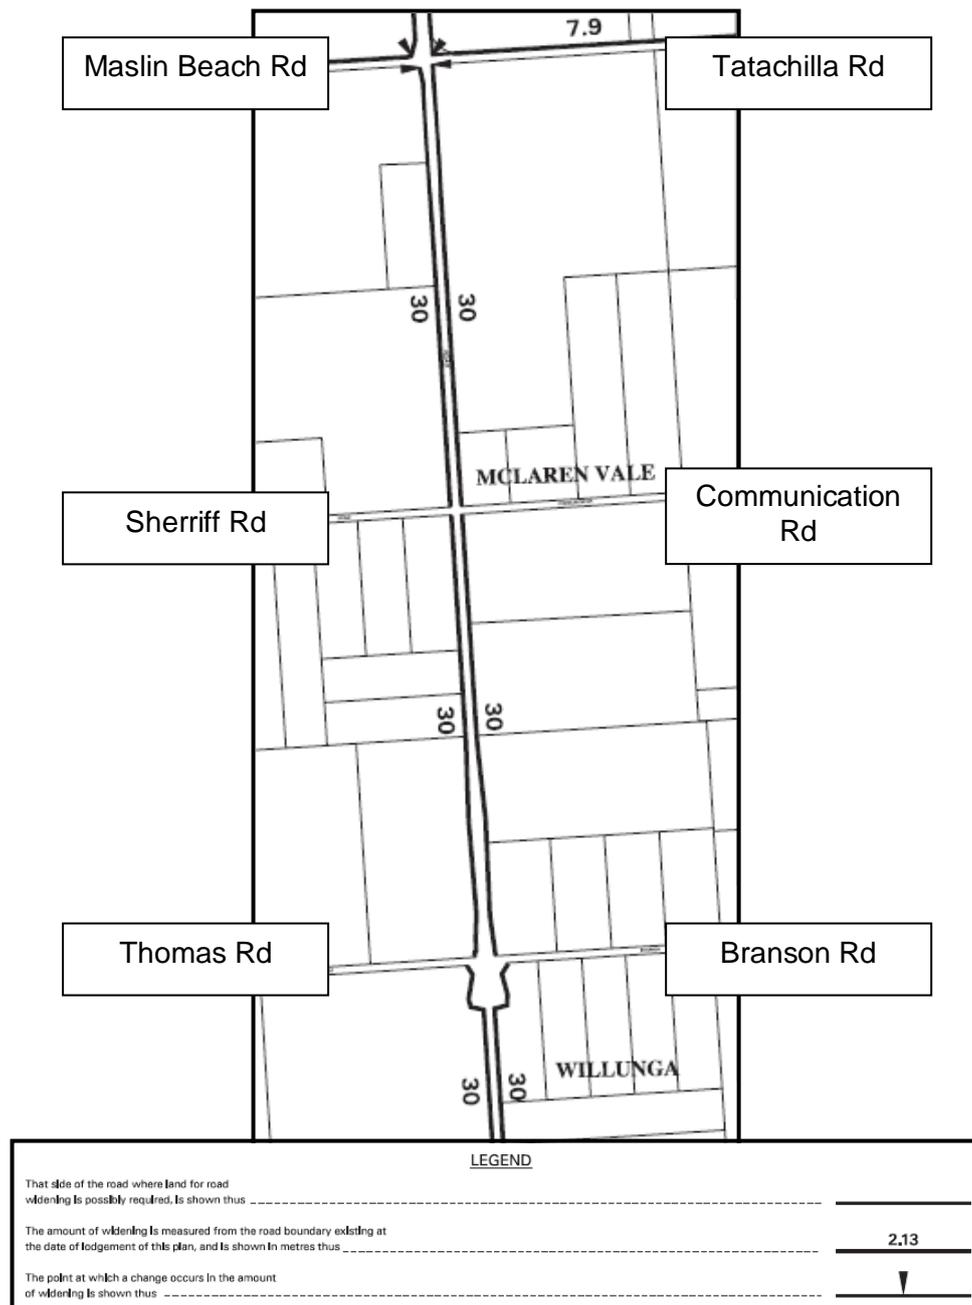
(a): Metropolitan Adelaide Road Widening Plan (MARWP) Requirements on Main South Road
